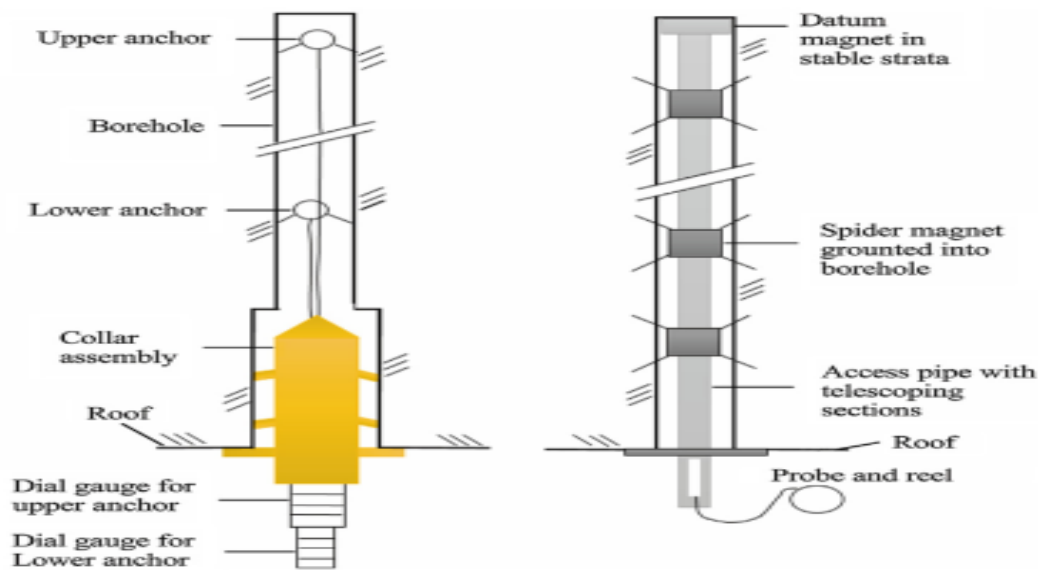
Multi-point extensometers - wire (left); magnet (right).
